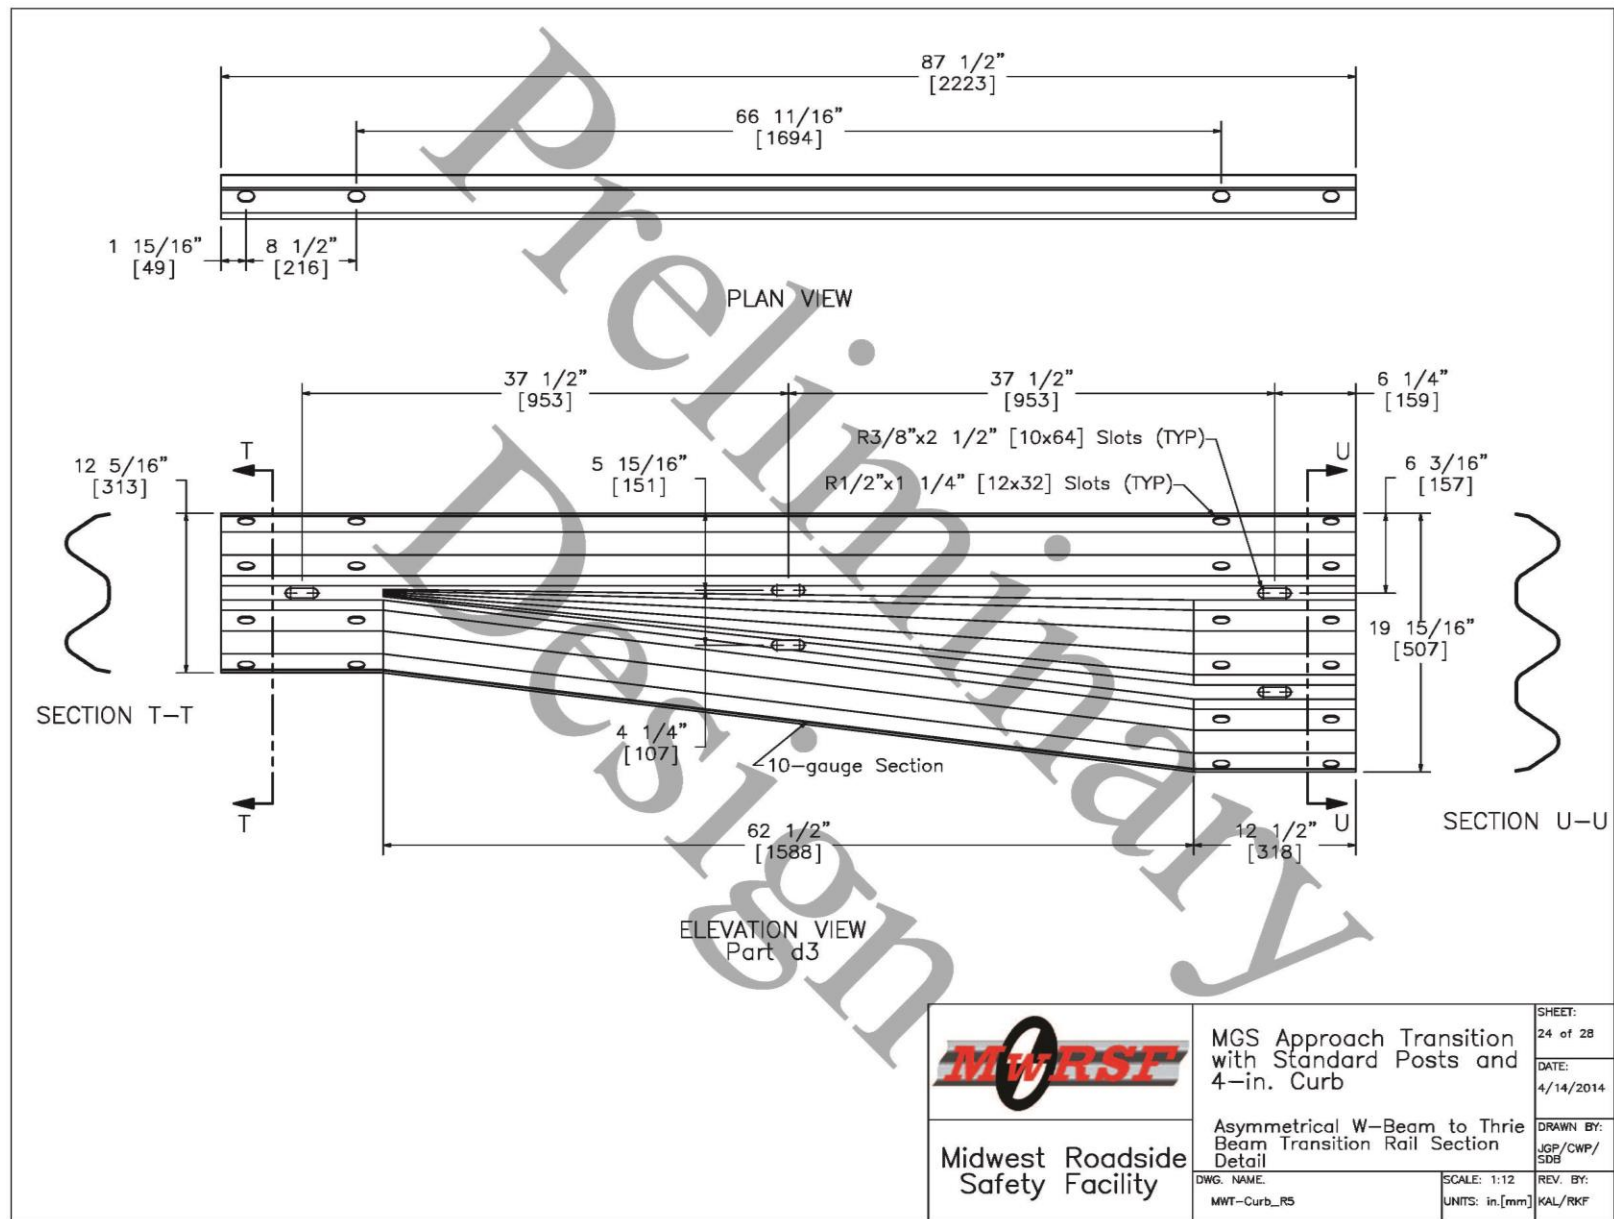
Asymmetrical W-Beam to Thrie Beam Transition Rail Section Detail, Test No. MWTC-1
